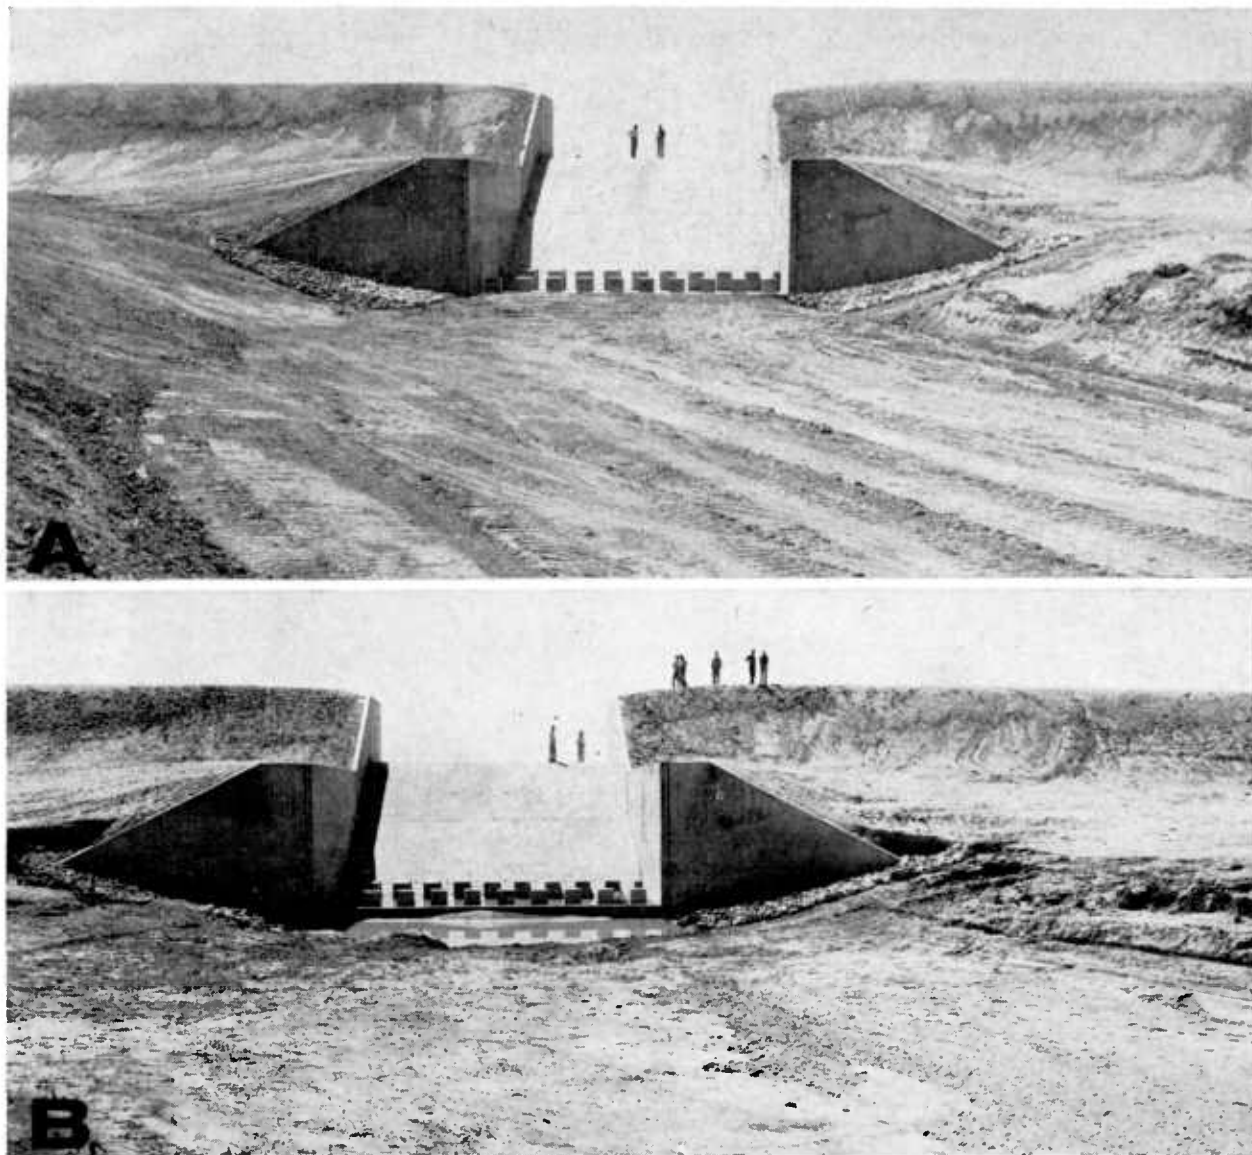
San Simon drop structure—Spillway crest elevation is 88 feet; dam crest elevation, 103; end sill elevation, 68; chute, 40 feet wide; and stilling basin sidewalls, 18 feet high: A, After completion of structure, July 10, 1955; and B, after flow of 2,200 c. f. s., September 26, 1955.
